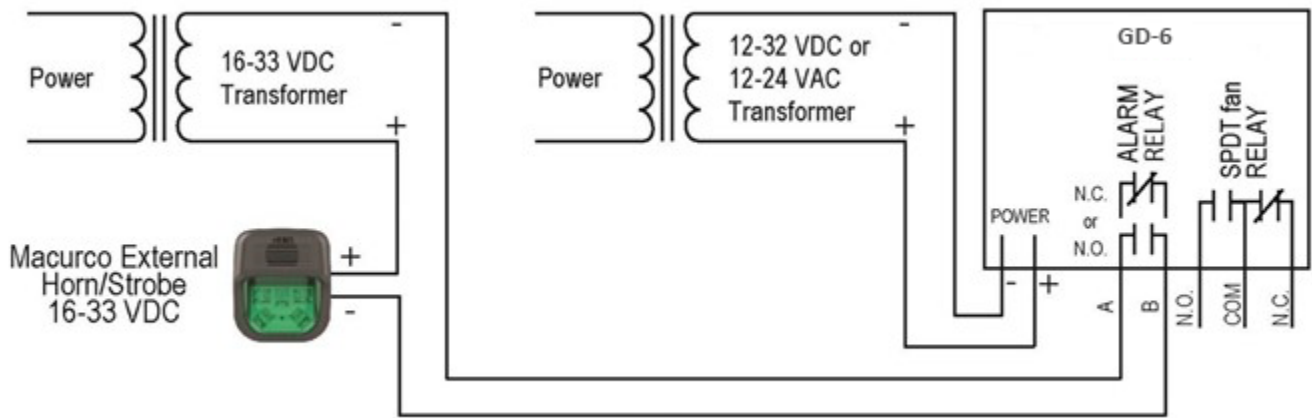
6-Series Horn & Strobe Combo Wiring
